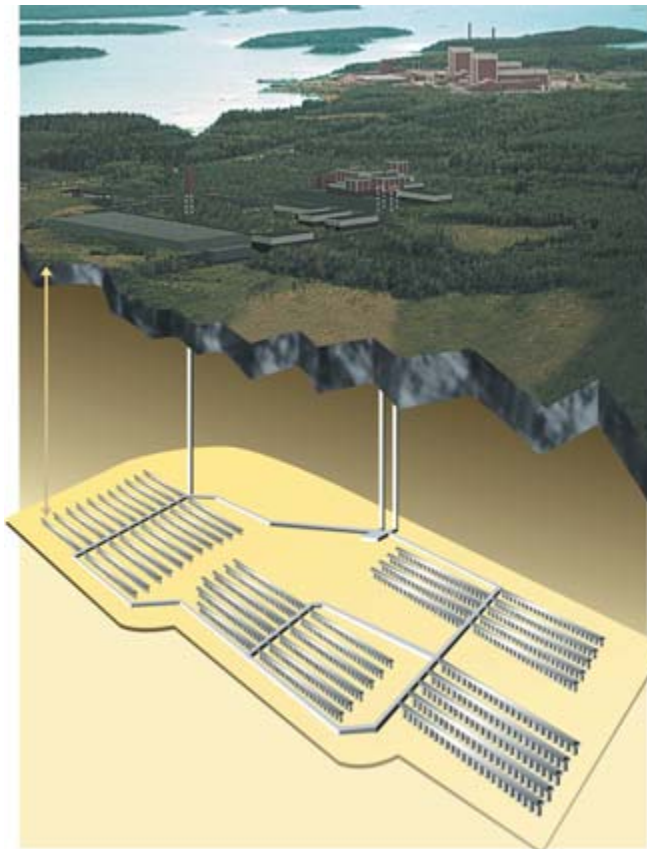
Generic layout of the disposal facility at Olkiluoto (Posiva 2003).
